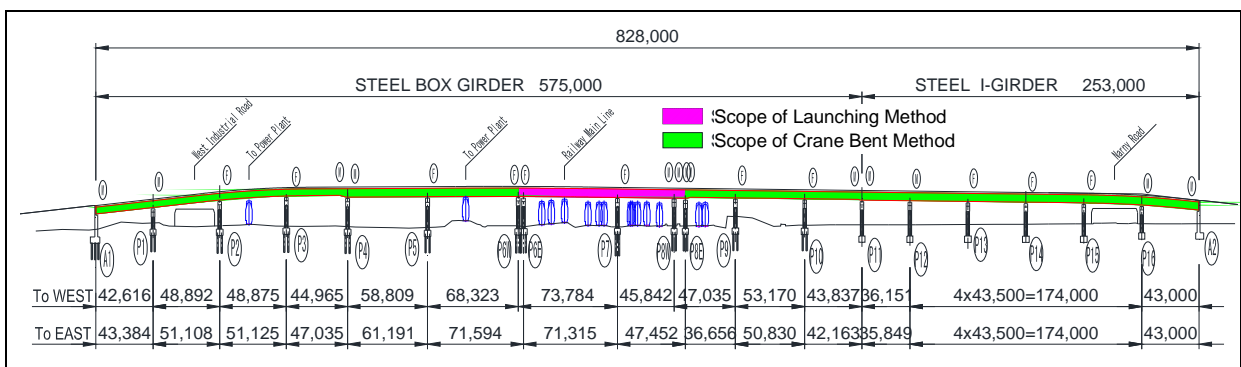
Girder Erection Methods for the Construction of Viaduct
